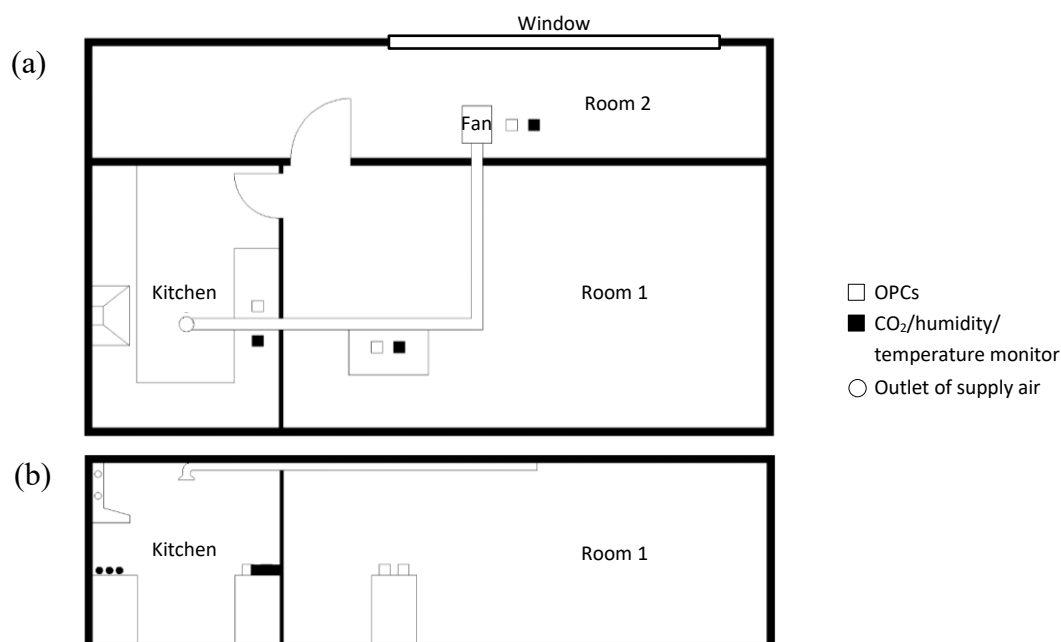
(a) Schematic floor plan and (b) cross-section of the testbed. Ductwork connected a fan located in room 2 with the kitchen.
